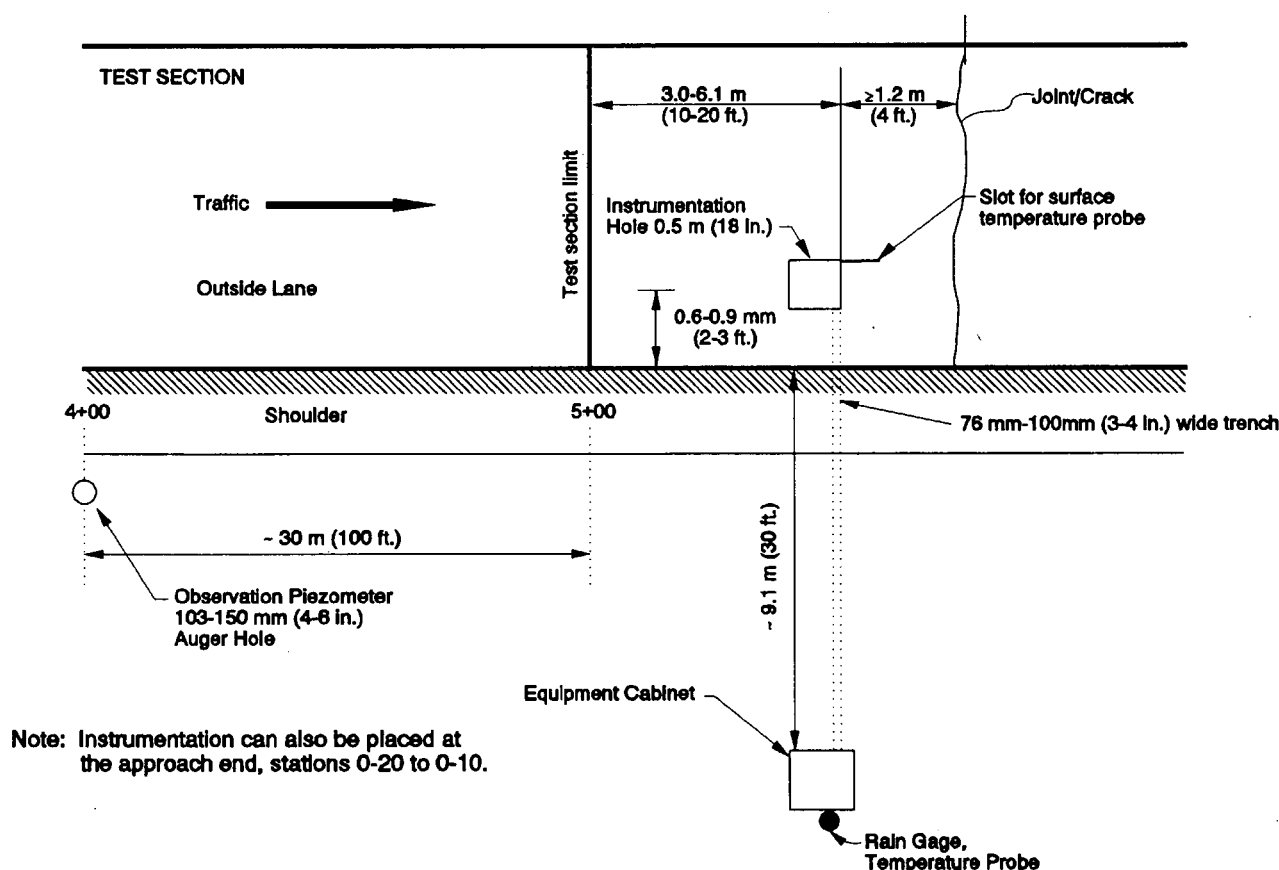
Typical instrumentation layout on asphalt concrete (AC) pavement.
